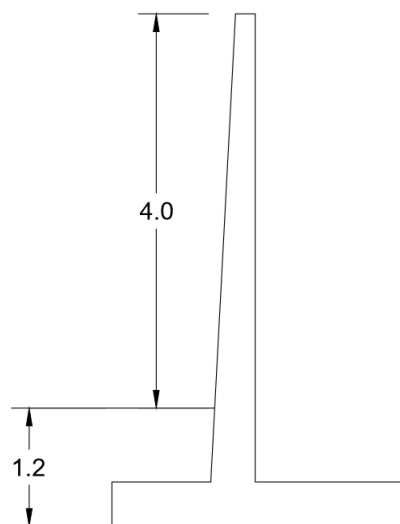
Cantilever retaining wall (Depth of foundation)
